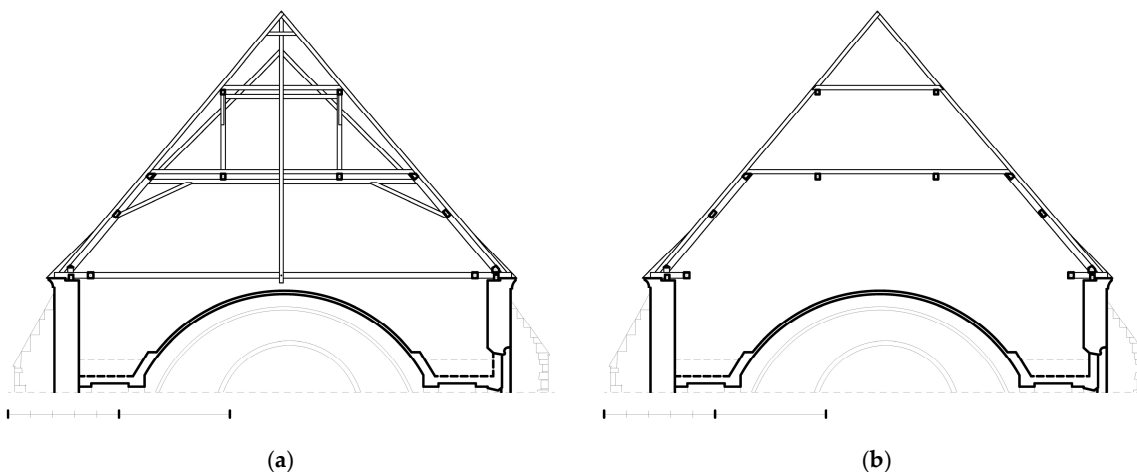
Turda church roof trusses: (a) main truss; (b) secondary truss.
